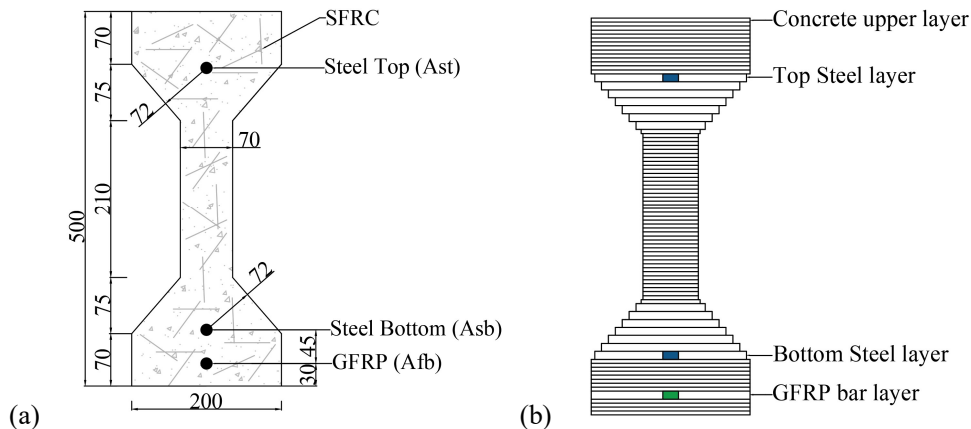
Beam cross-section: (a) Geometry and disposition of the reinforcements (dimension in mm) (b) Layered model
